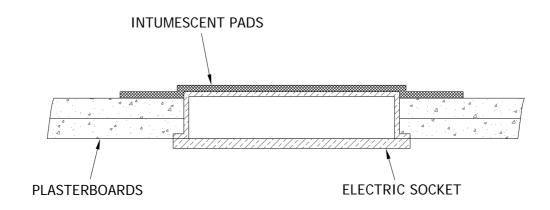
Sections through the electrical sockets showing the positions of the putty pads
